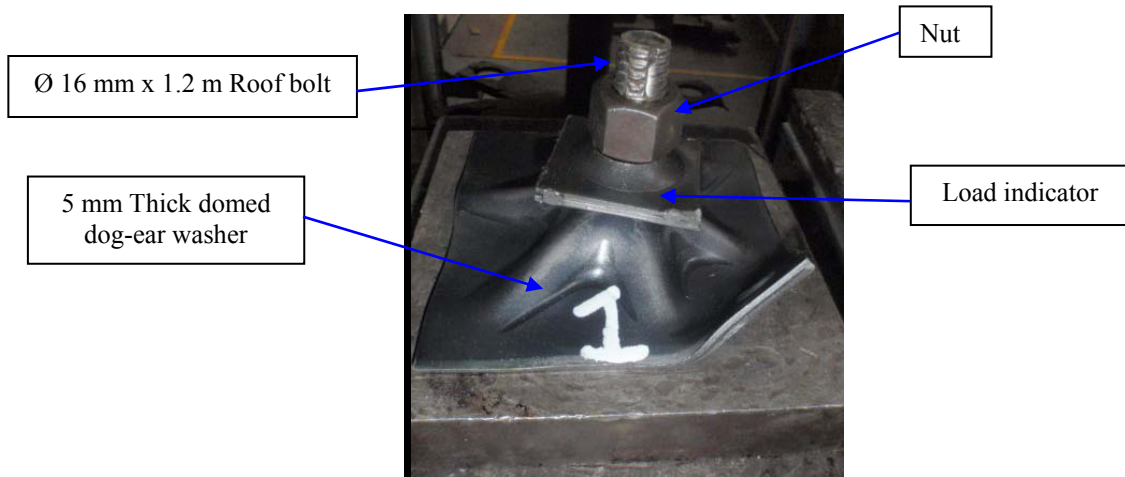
Y16 x 1.2 m Long Roof bolt assembly installed in the testing machine.
